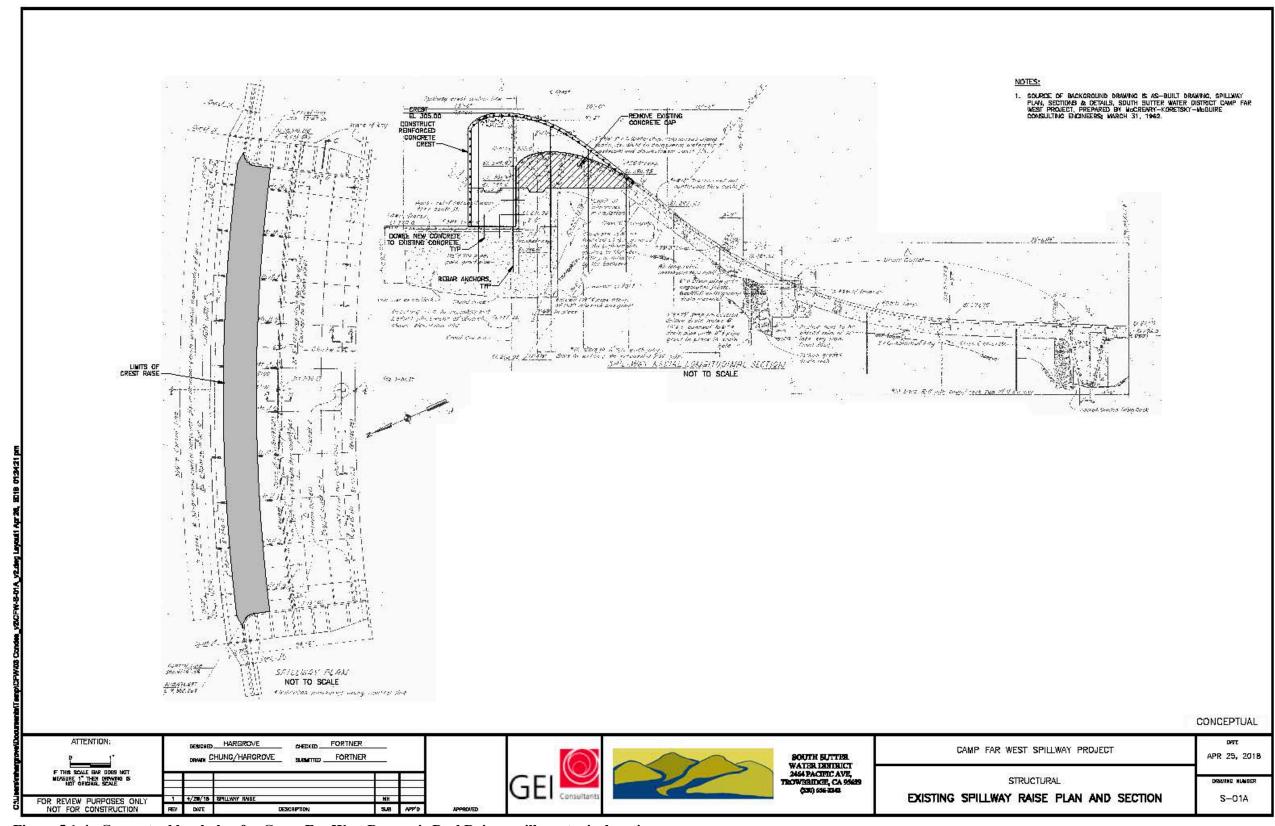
Conceptual level plan for Camp Far West Reservoir Pool Raise - spillway typical section.
